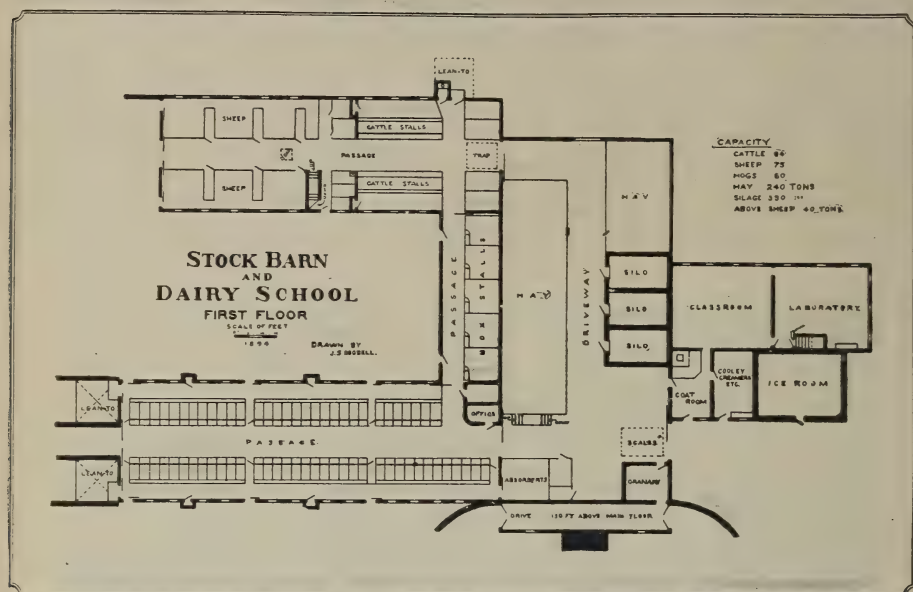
Ground plan of Massachusetts College stock barn—first floor.
